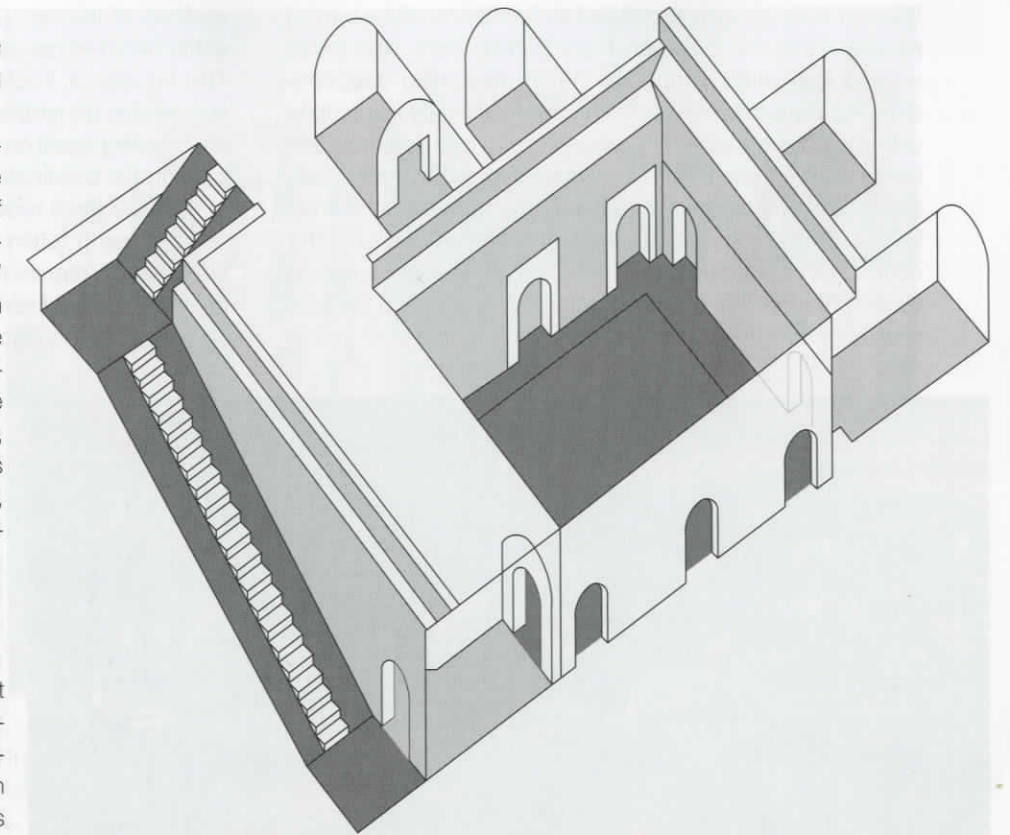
Loess Plateau, central China. Plan of cave house, or yaodong, dug into the dense soil. This typical earth dwelling has been used since the first millennium BCE.
